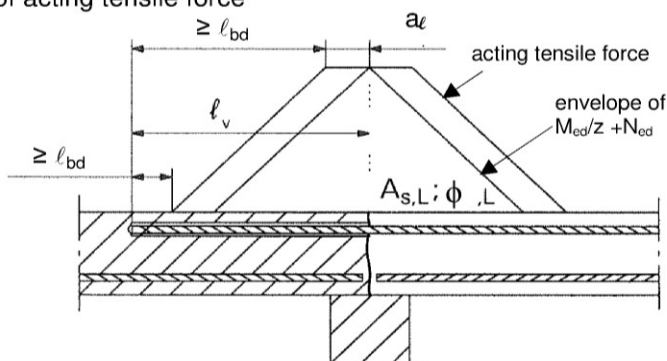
End anchoring of slabs or beams (e.g. designed as simply supported)
